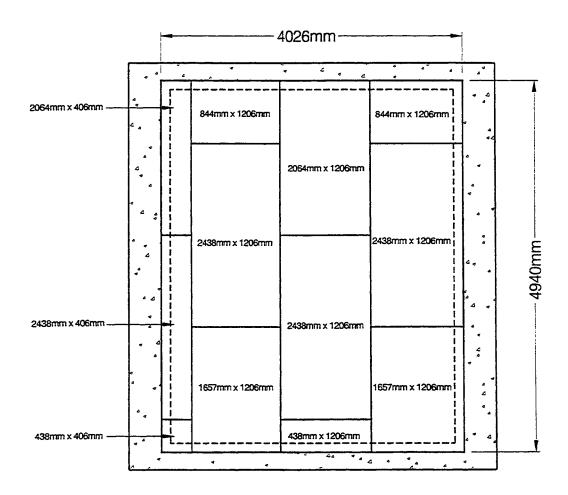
Face layer subfloor layout, joists 406 mm o.c.
